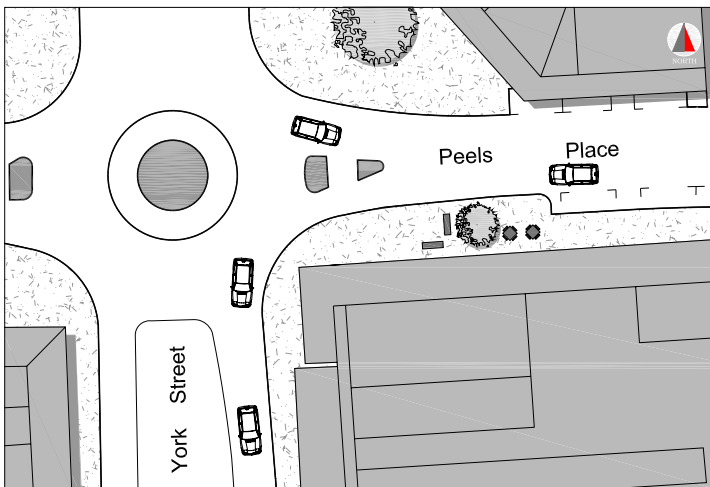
Proposed widening of footpath on south-east corner of York Street and Peels Place
